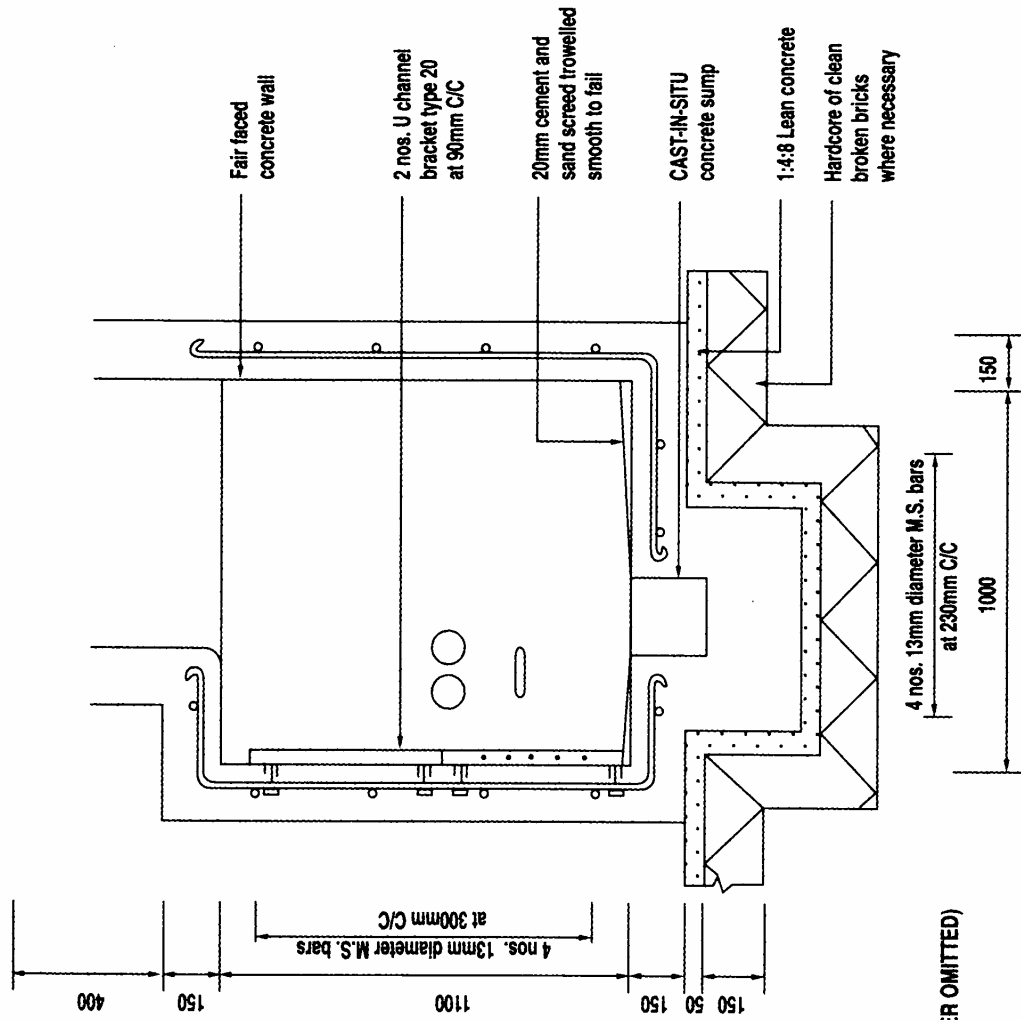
MANHOLE DRAWINGS - TYPE MX1
